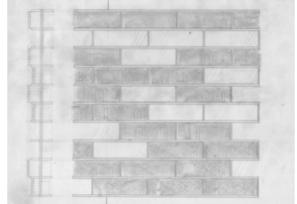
Mike Sollenberger, Temple University, detail section and elevation study of building enclosure.
